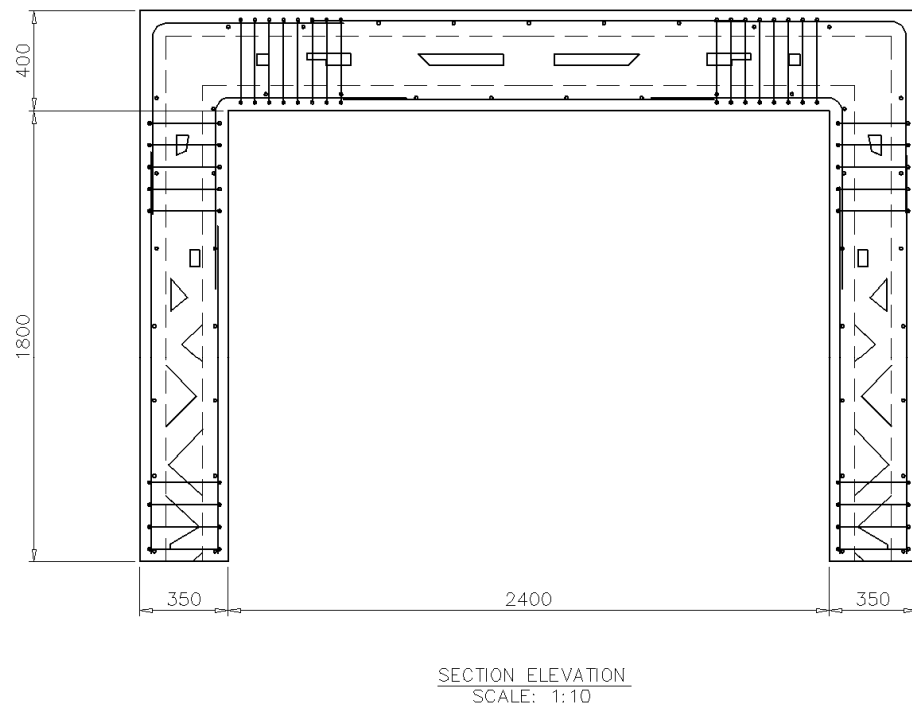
Optimised 2418 RCBC with trimmed voids and reinforcement
